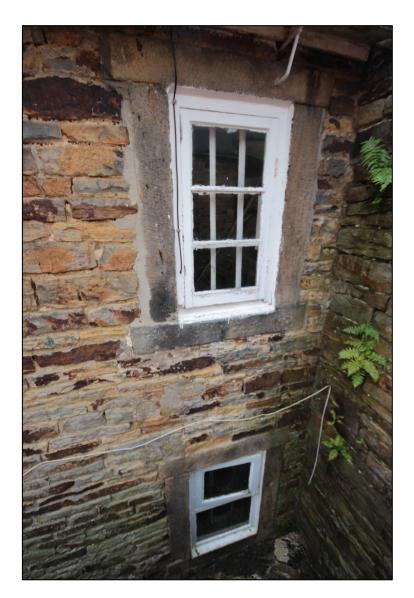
View of the ground floor subterranean window, and first floor window, facing east.
